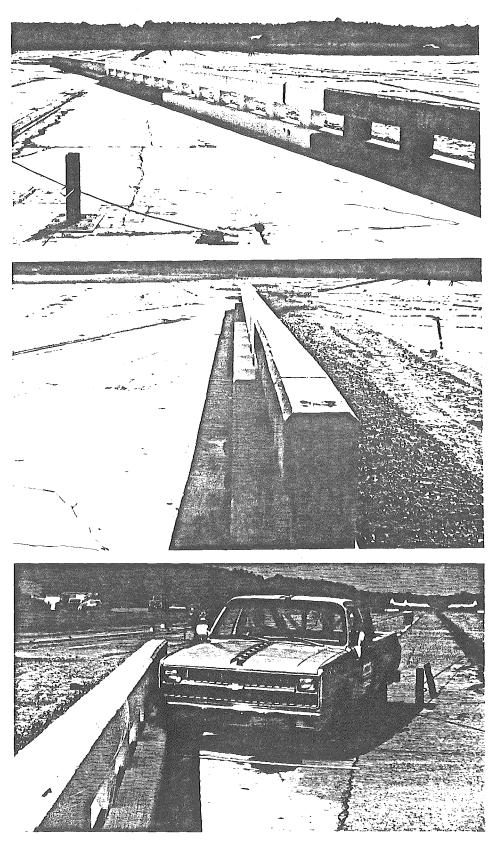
Pretest photographs of bridge rail system, test 1952-7-91.
